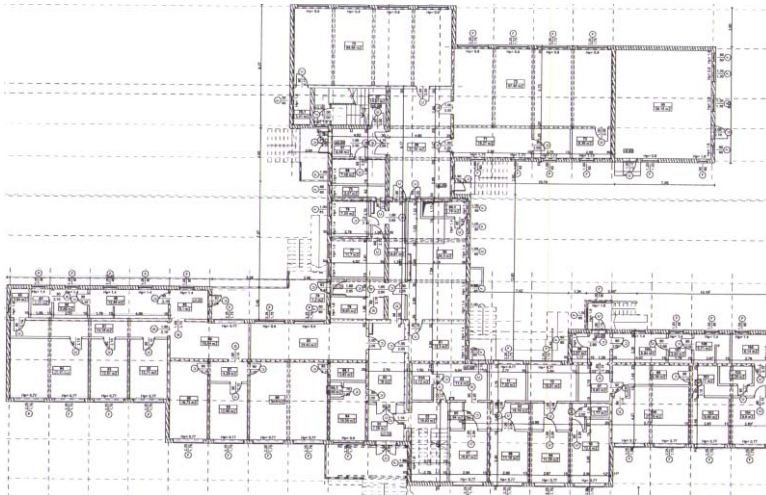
Floor plan of Reabilitarea Building in Timisoara
